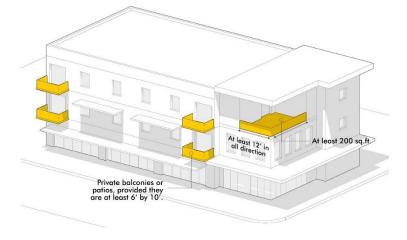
Private or Common Open Spaces Private or commons areas incorporated into the building can provide a portion of the useable on-lot open spaces. These elements can also meet design requirements for breaking up the massing or blank wall of buildings24-603.d.2.(c) and (d)
